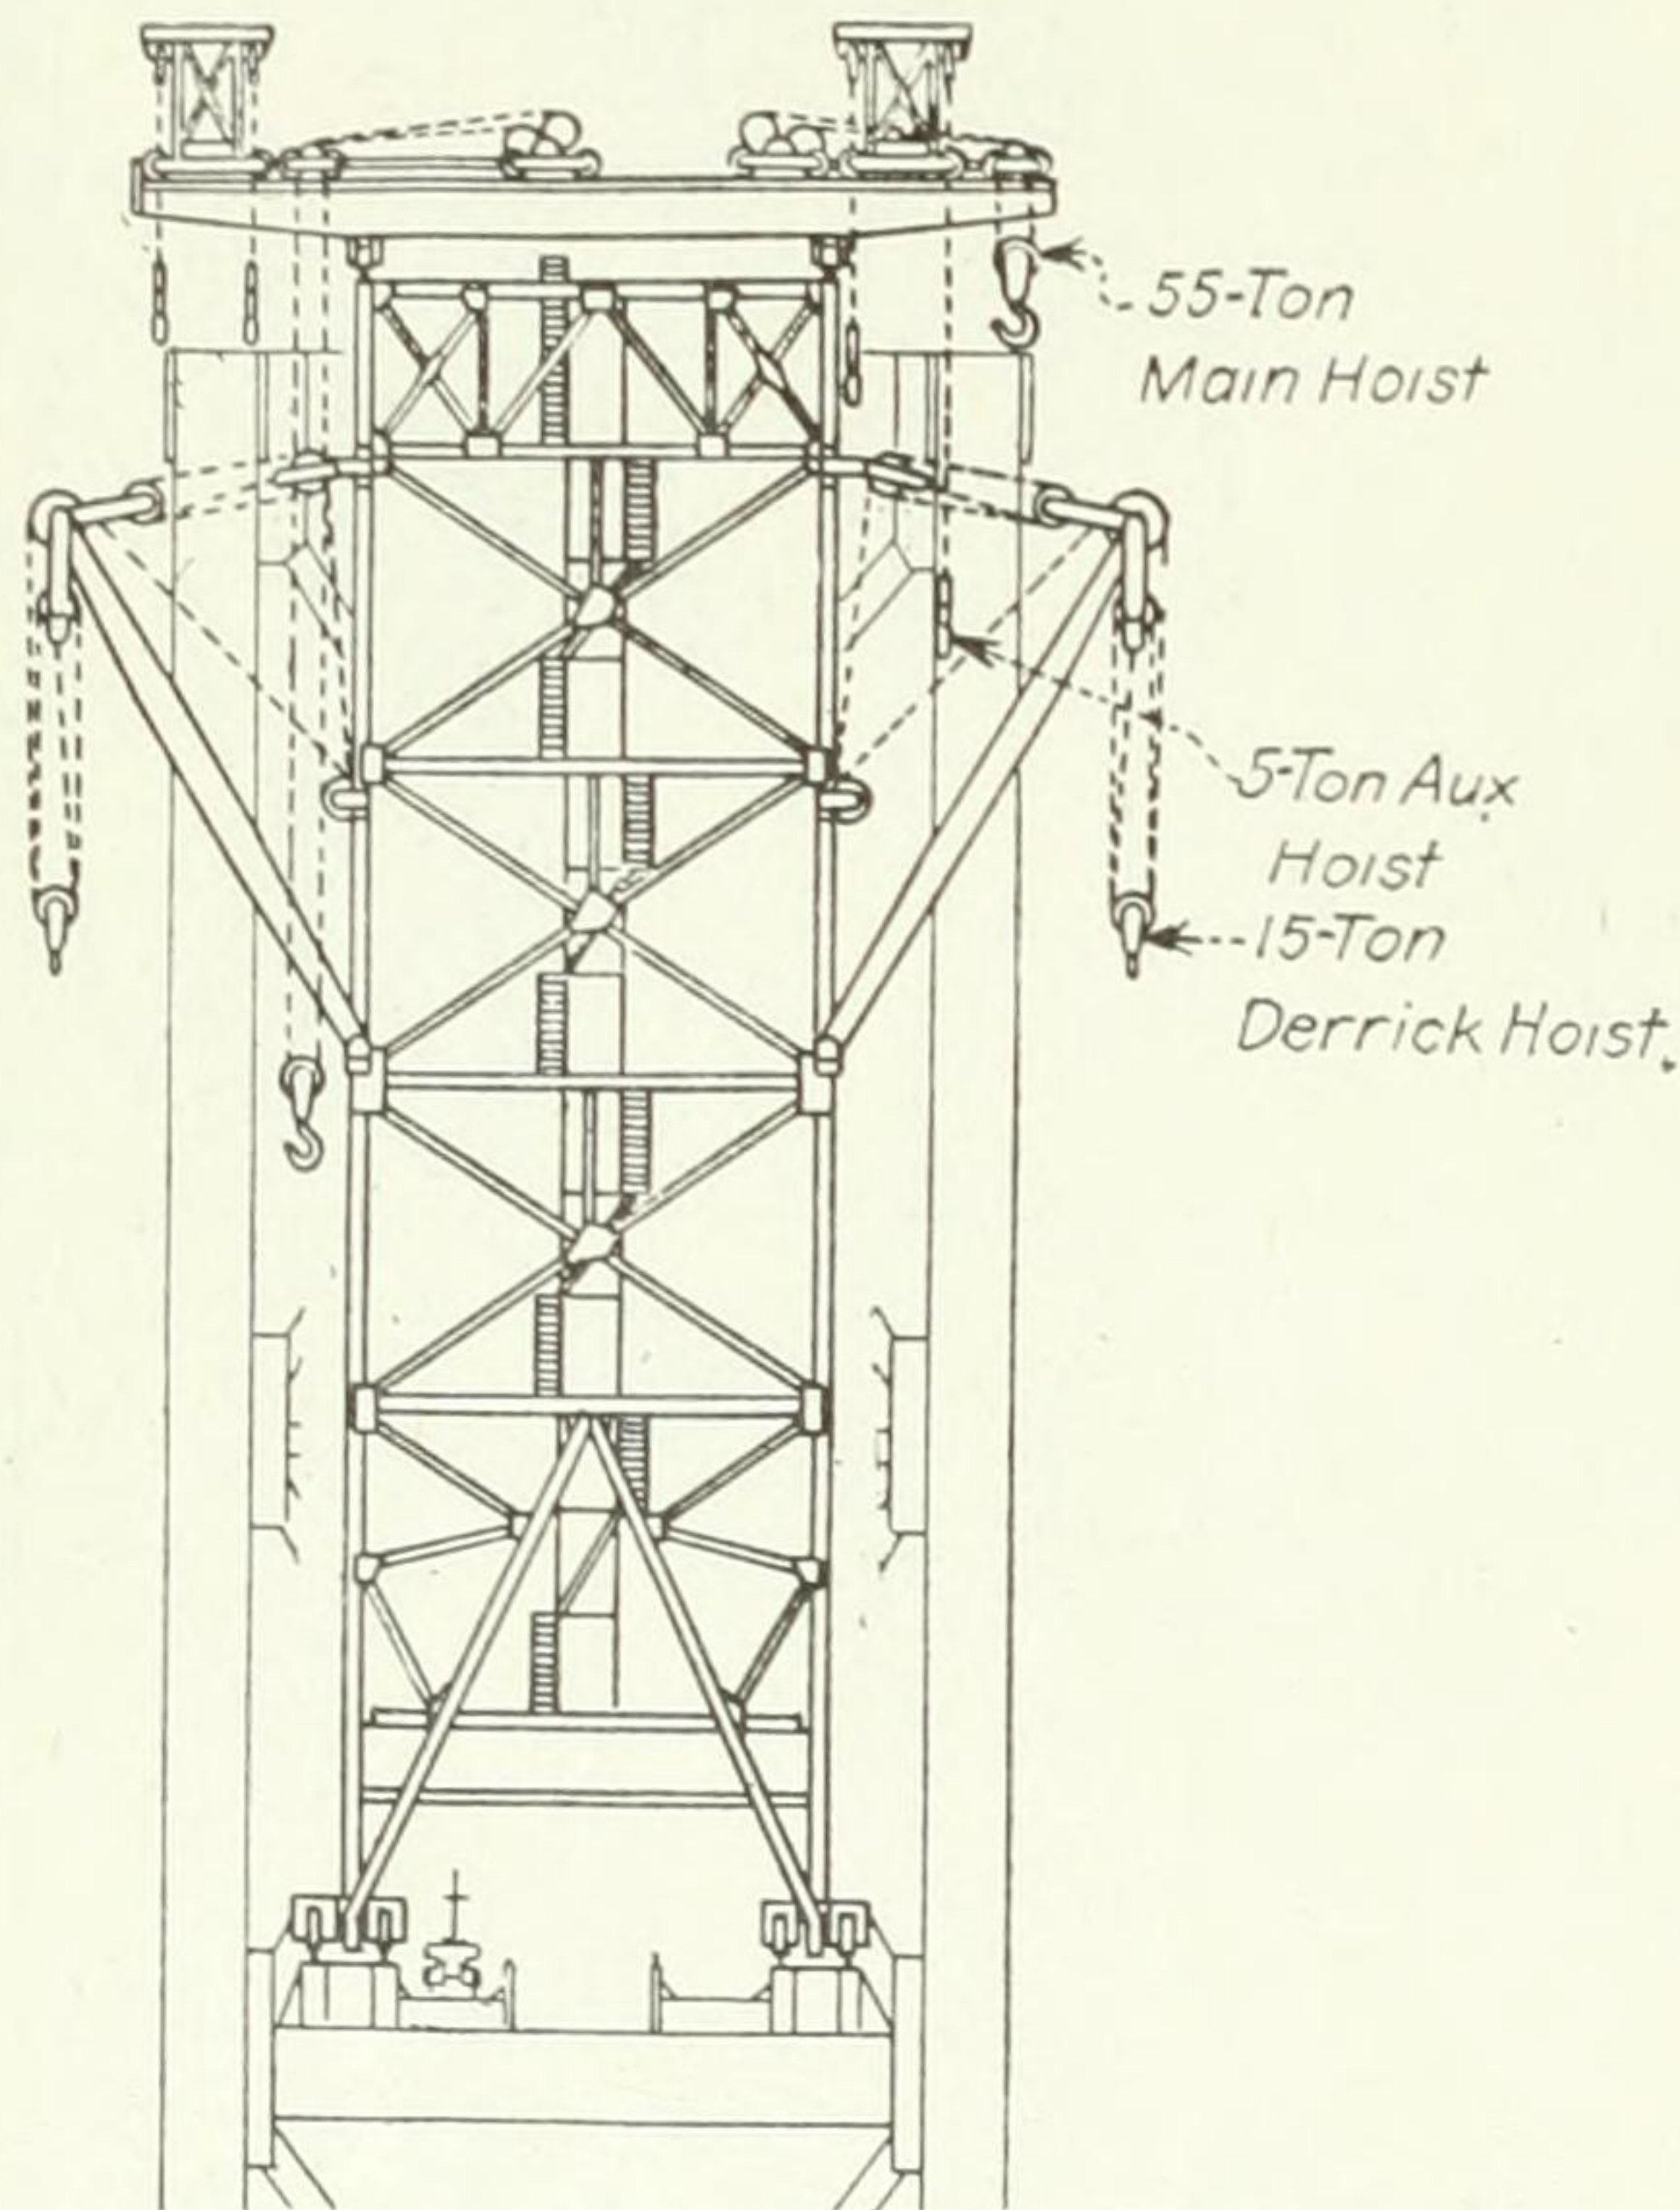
End Elevation of Erection Tower, Showing Location of Hoists.
